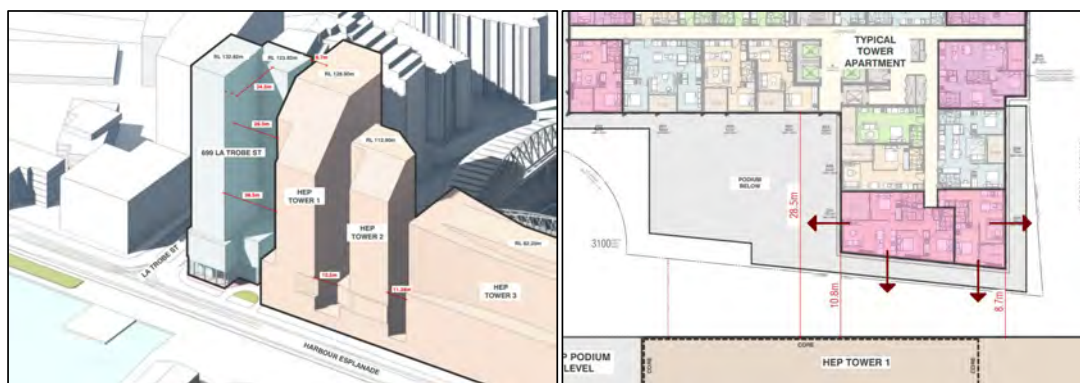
Tower setbacks from the approved Harbour Esplanade envelopes (left) and a typical floorplate (right) (source: applicant)
